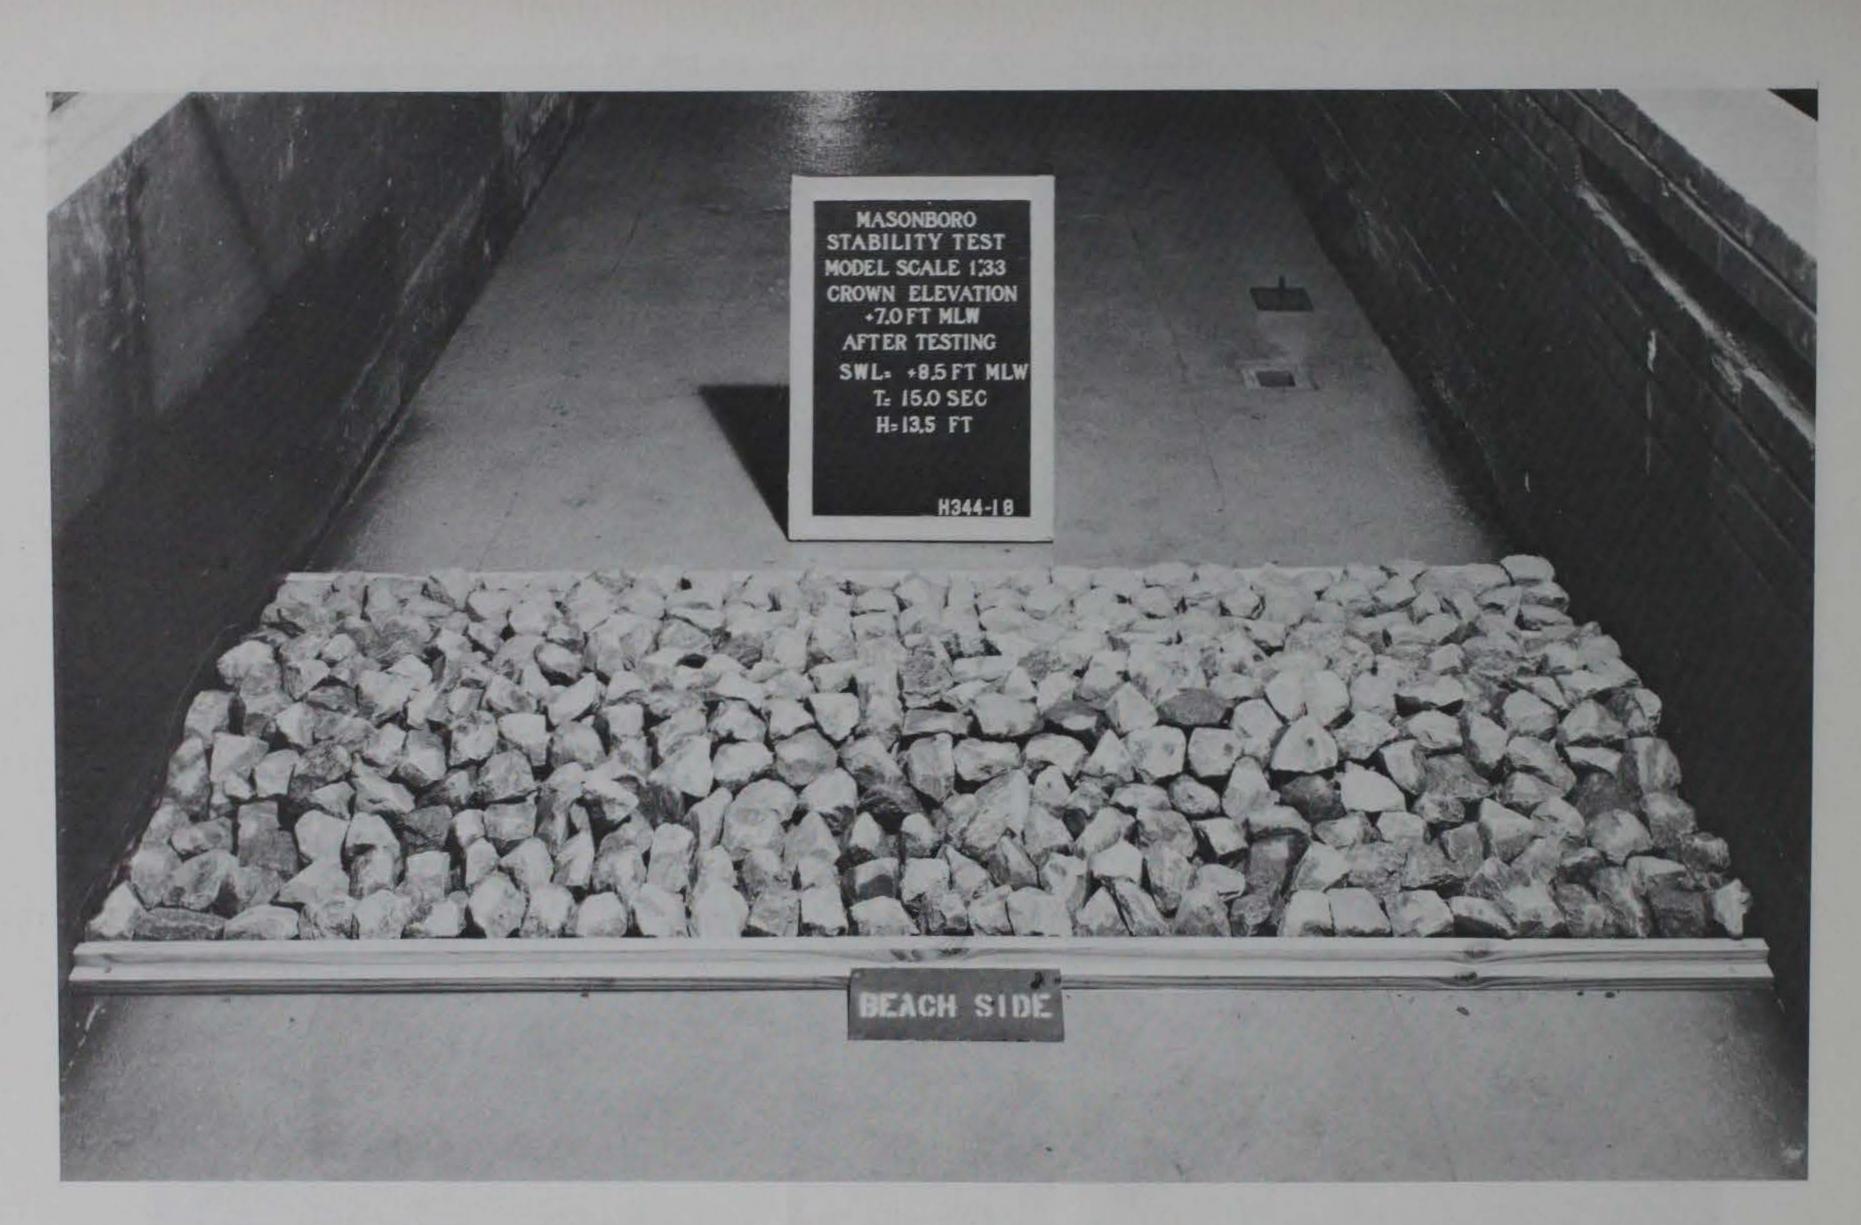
Beach-side view of Plan 3A after attack of 15-sec, 13.5-ft waves at an swl of +8.5 ft mlw for 2 prototype hr
